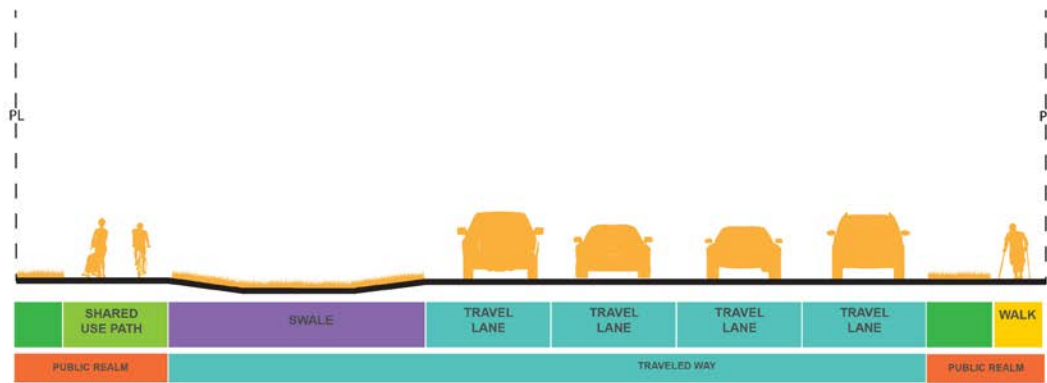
Potential future 50 Street cross section with existing drainage swale maintained and additional pedestrian walk installed.
